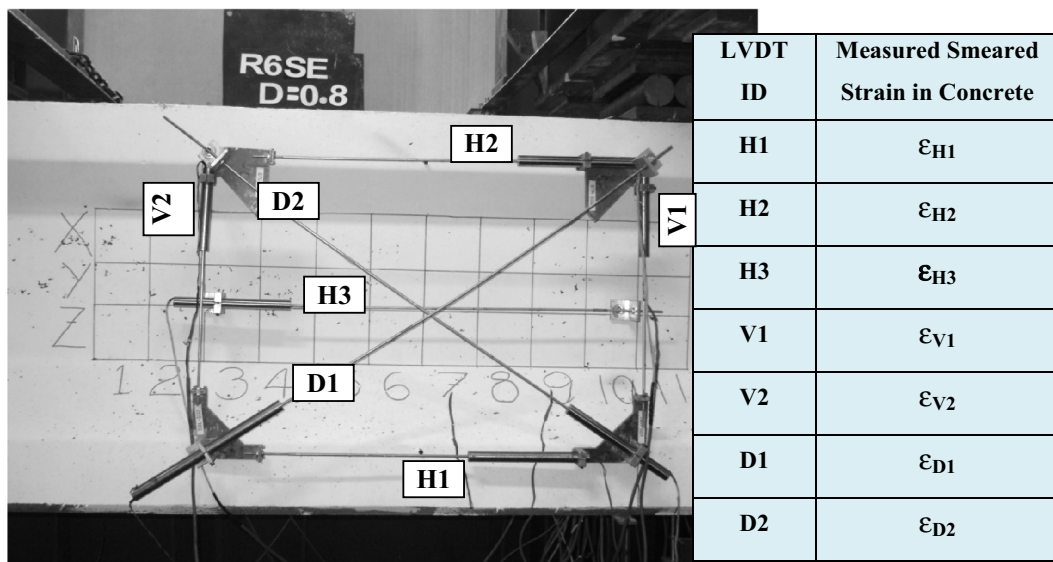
Typical LVDT rosette used to measure smeared/average concrete strains in PSFC beams.
